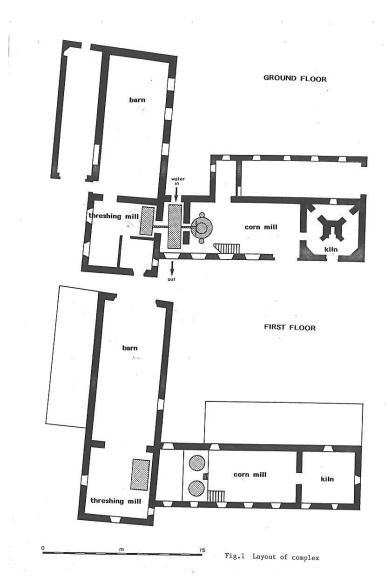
Ground and First Floor plan of the Castle Ward(N.T.) Corn Mill
